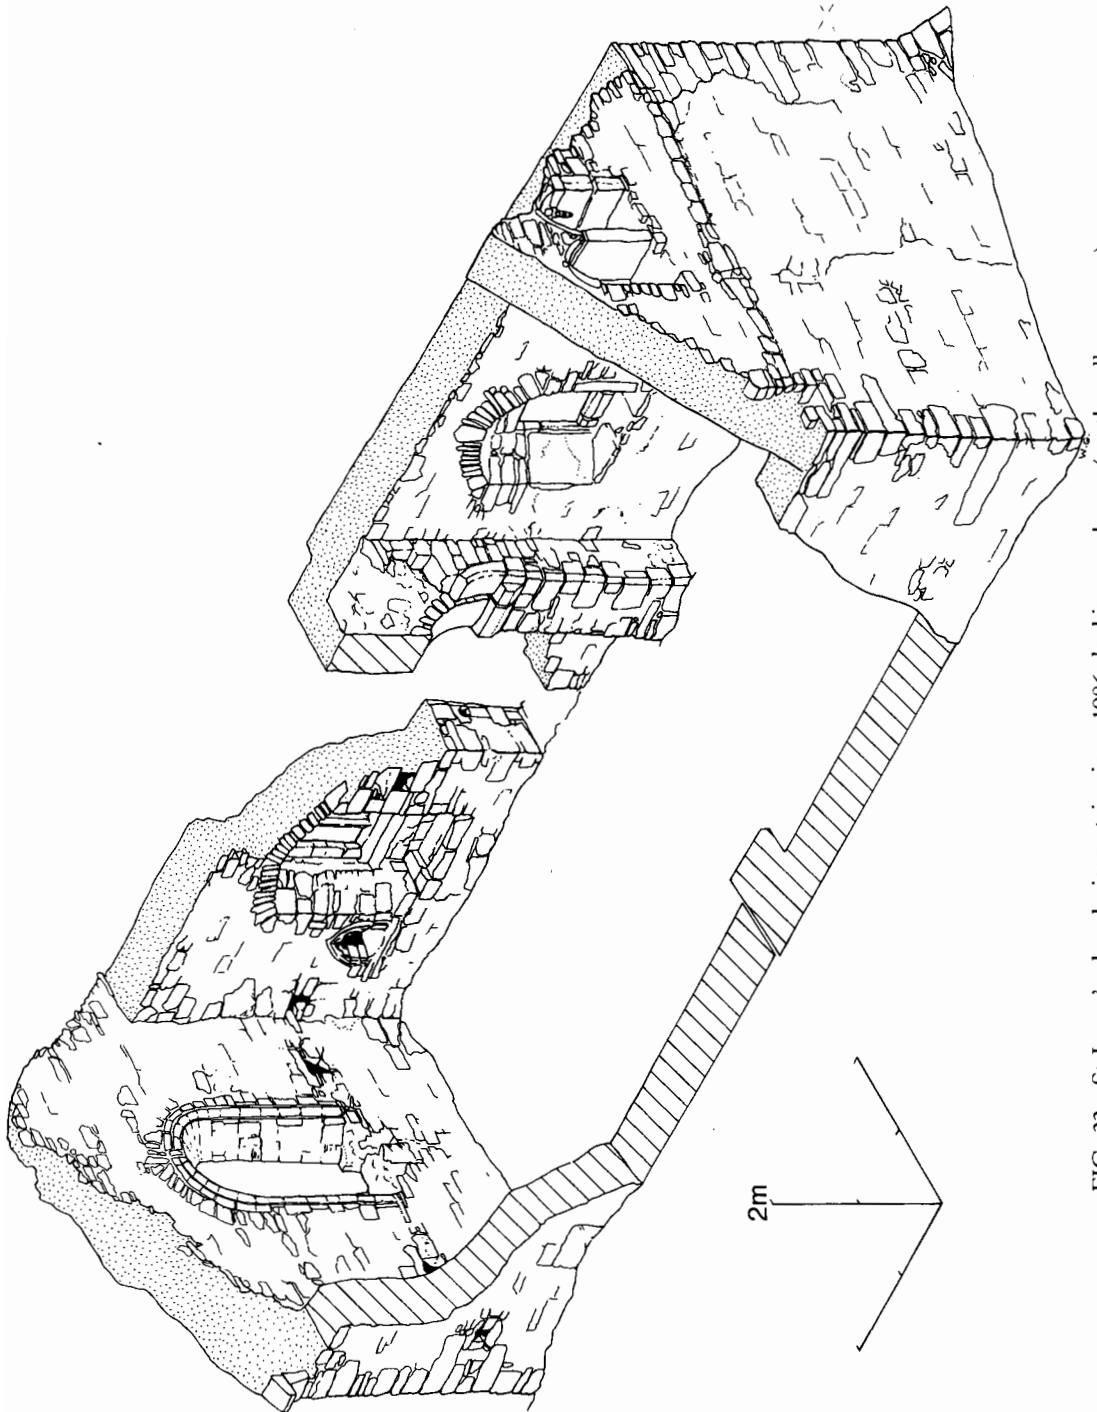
St James's church; isometric view, 1986, looking south-east (north wall cut away).
